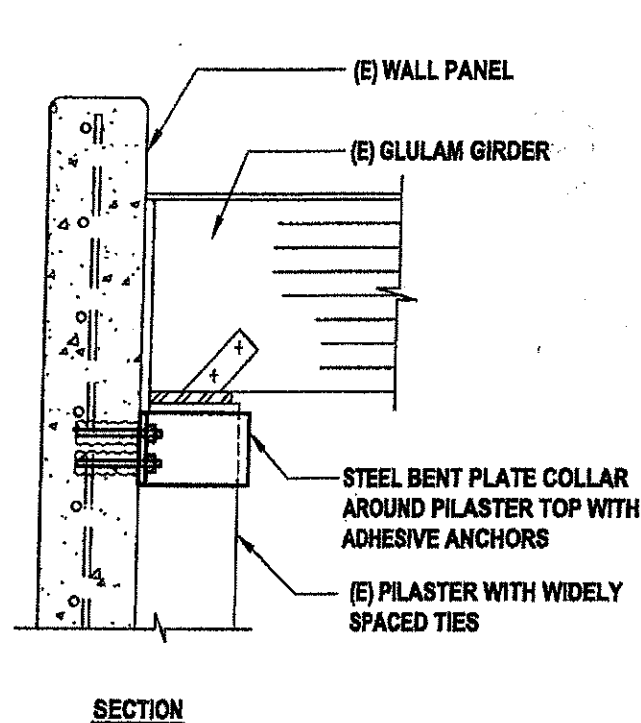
Enhanced Girder Connection – Collar at Pilaster
